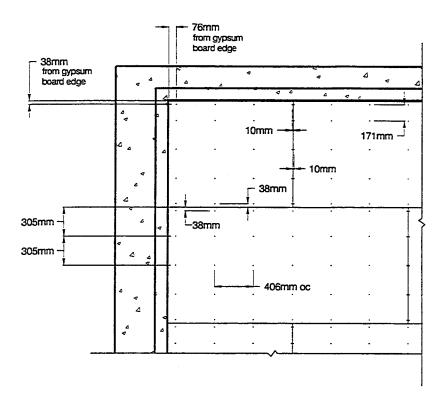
Screw patterns for face layer of gypsum board with resilient metal channels 406 mm o.c.
